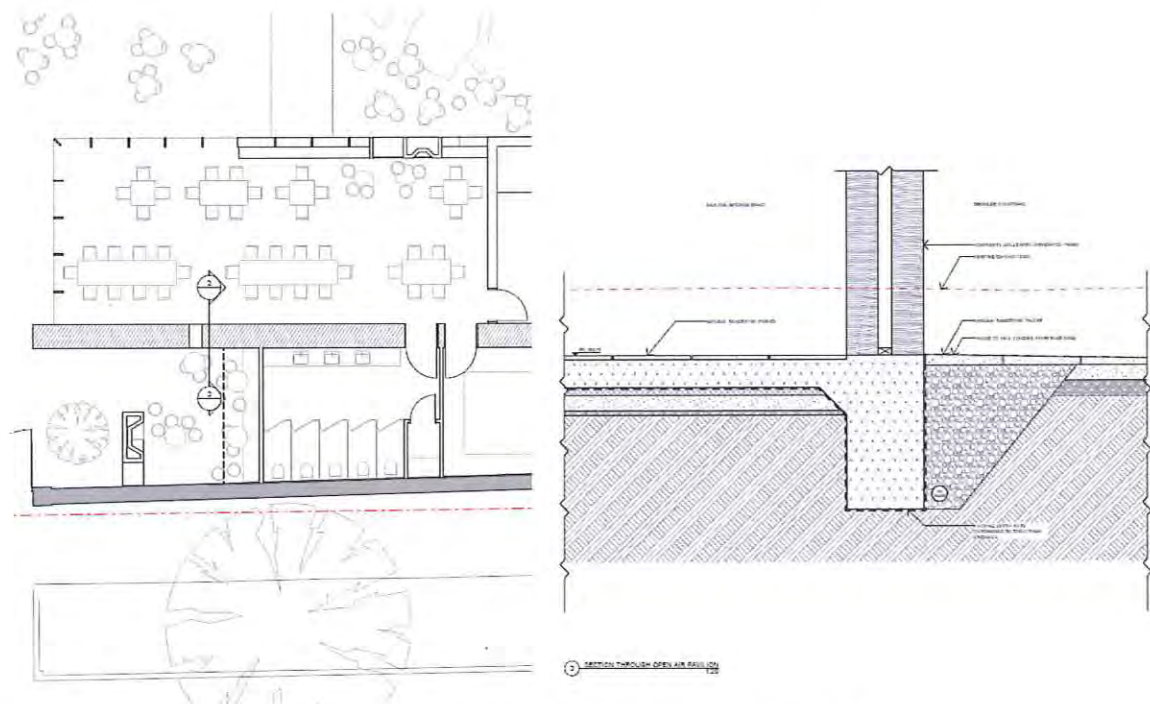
Indicative foundation specifications, pavilion/toilets dividing wall.
